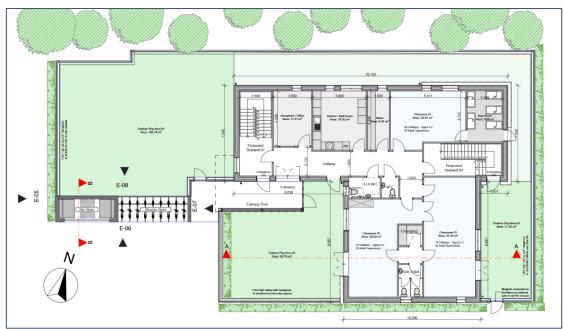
Creche Detail (Ground Floor only, refer to drawing 18128-3280)
